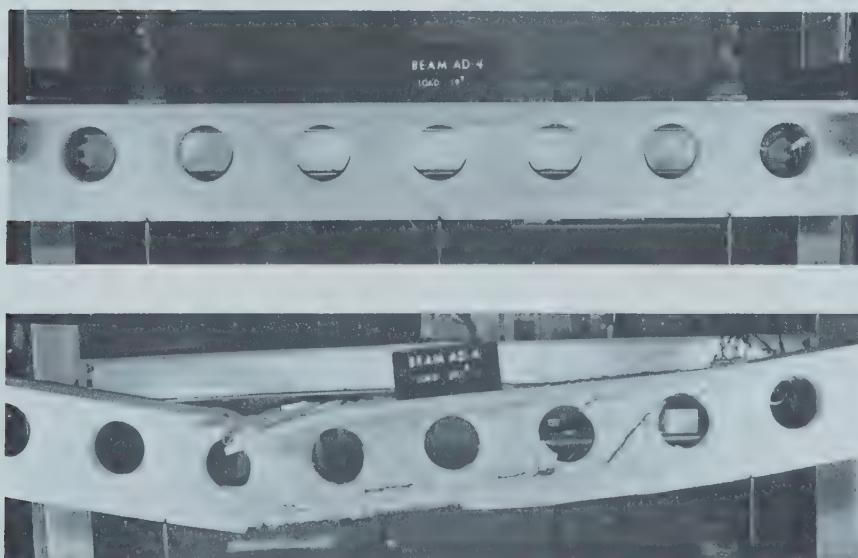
BEAM AD-4 CRACKING AND FAILURE PATTERNS
